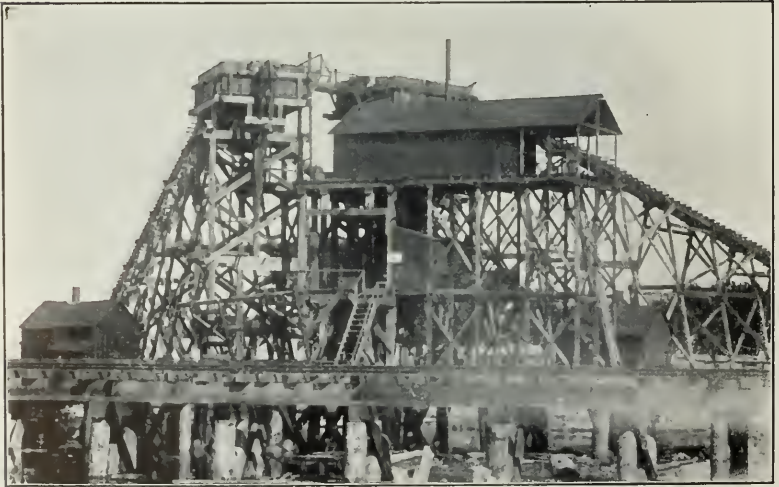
STAGING FOR CONCRETE MIXER, INCLINE TRESTLE FOR SAND AND PEBBLES, AND CEMENT ELEVATOR, DULUTH-SUPERIOR HARBOR.
